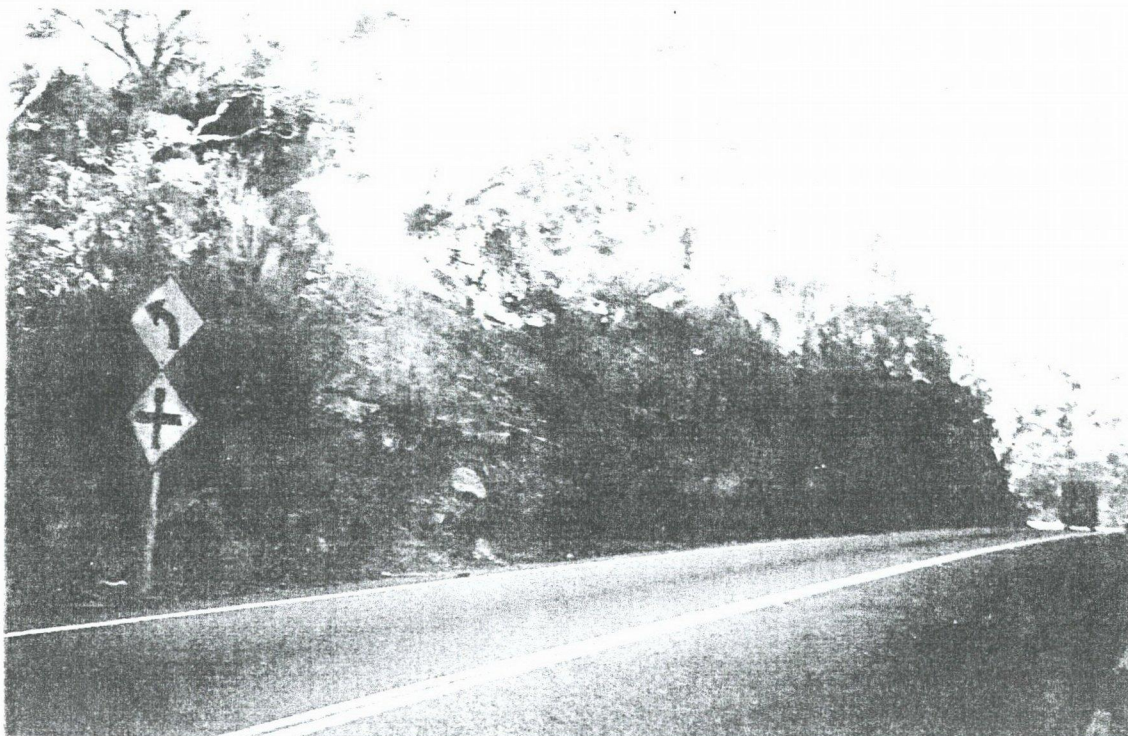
Structure of the southern batter. Photograph taken looking westward.
